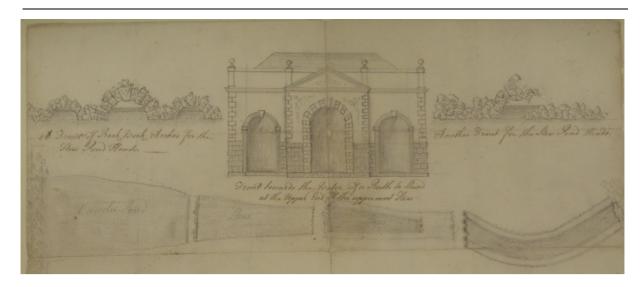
John Grundy Jnr's proposal for the Vaudey Pond, c. 1766 (*Vaudee Pond* lies on the left (east) of the picture)
